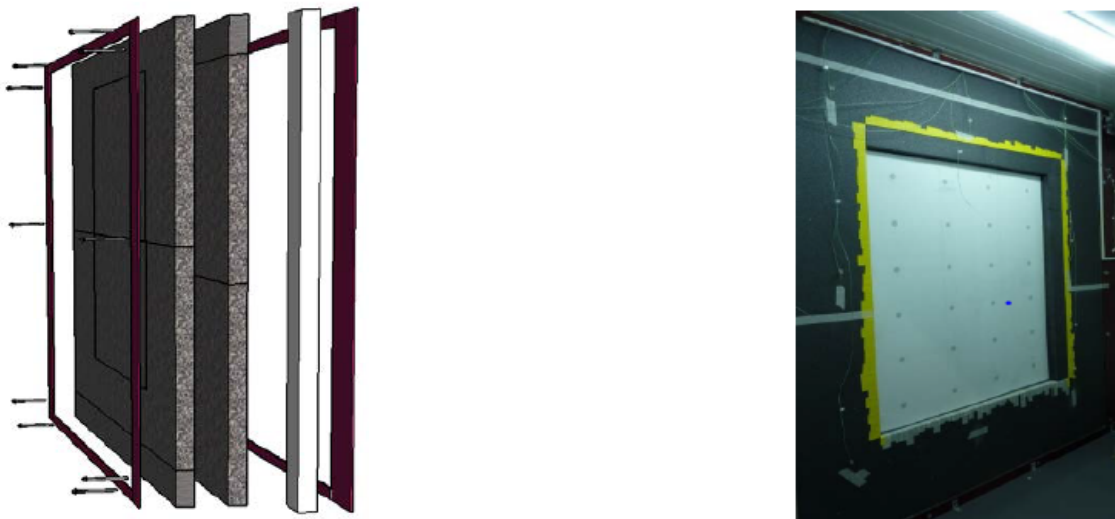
To the left typical configuration of separation wall with two layers of black EPS compressed between wooden frame, the white pillar is to enhance stability of the separation wall. To the right a photo of the separation wall from the warm side with a specimen mounted [11].
